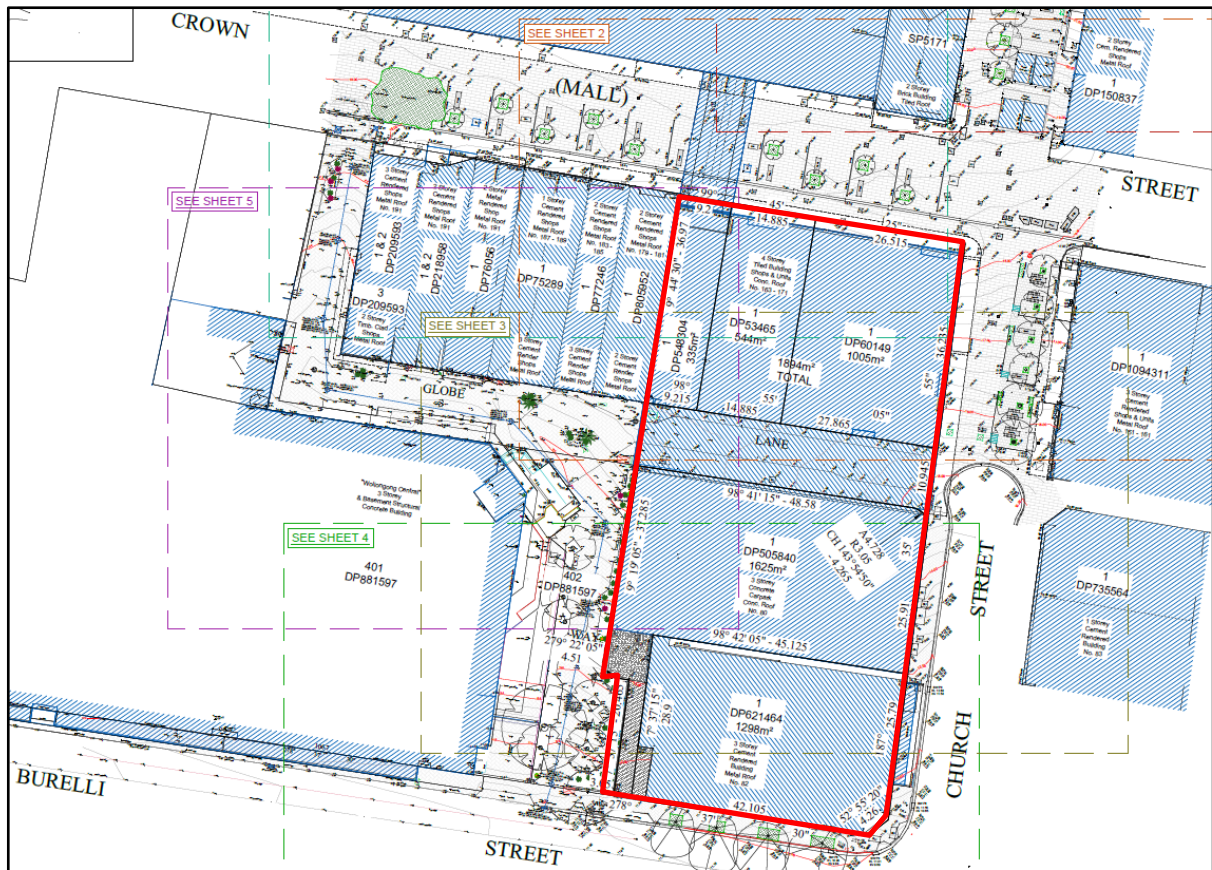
SUBJECT SITE SURVEY PLAN (MASTERS SURVEYING)
